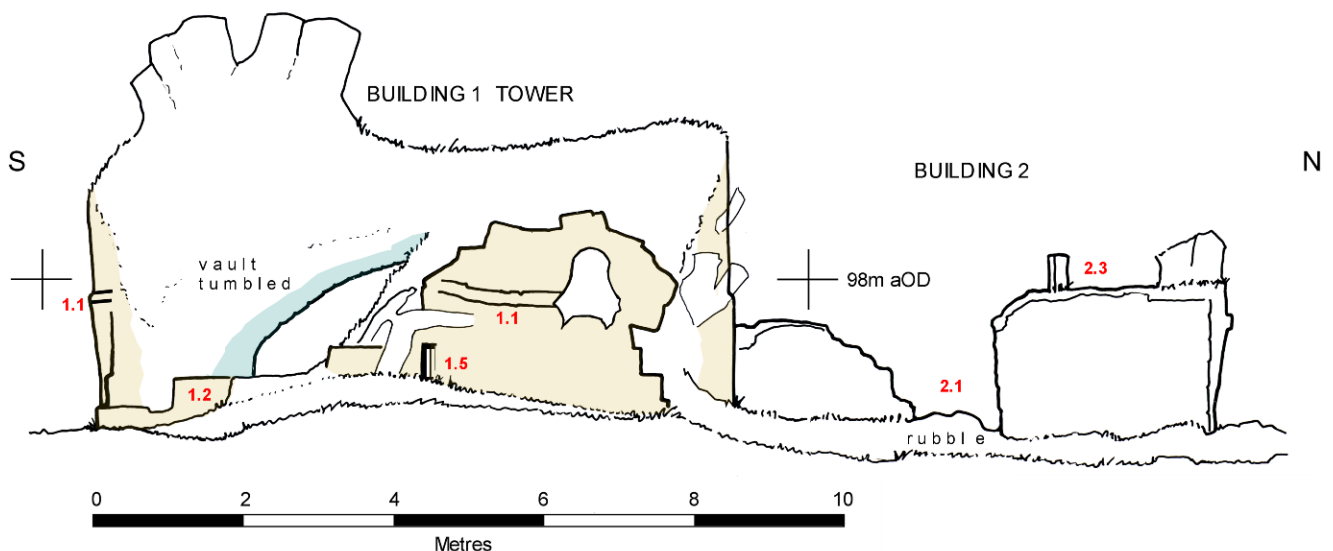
East elevation of Tower House and of Building 2. Surviving facing stones of tower in buff tone. Edge of tumbled vault in blue tone (1:100)
